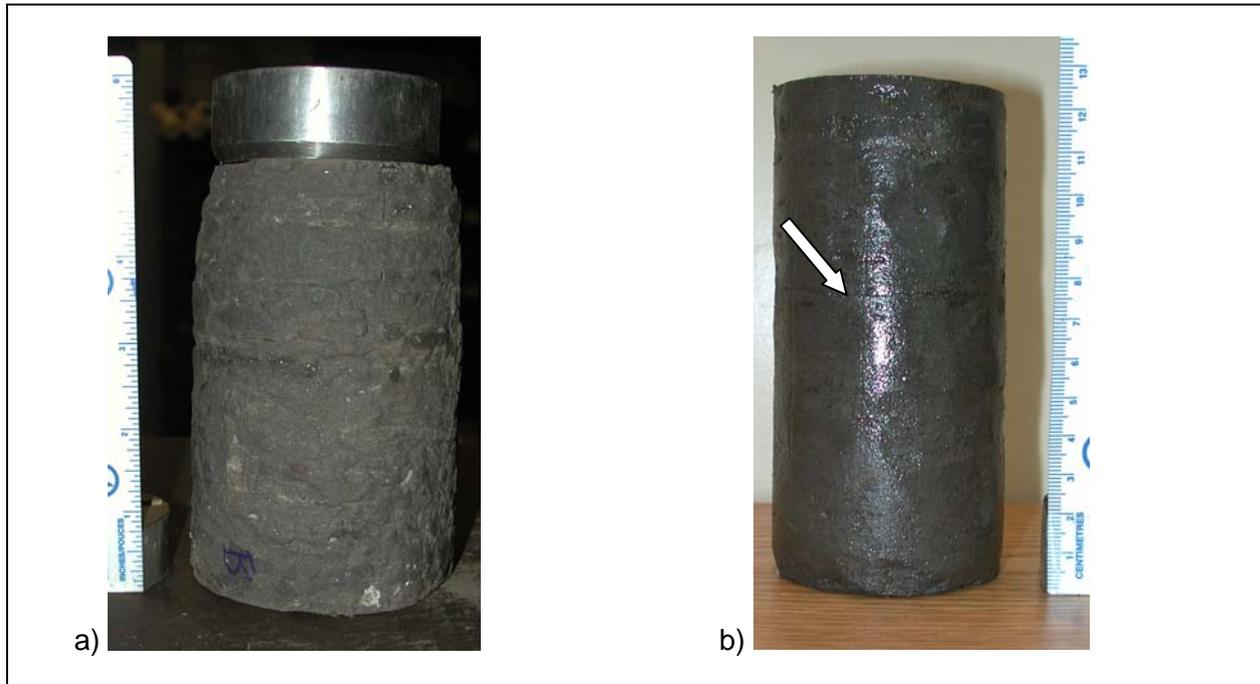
ST1 test specimen a) just after removal from liner b) after cutting (arrow denotes location of horizontal fracture in specimen)
